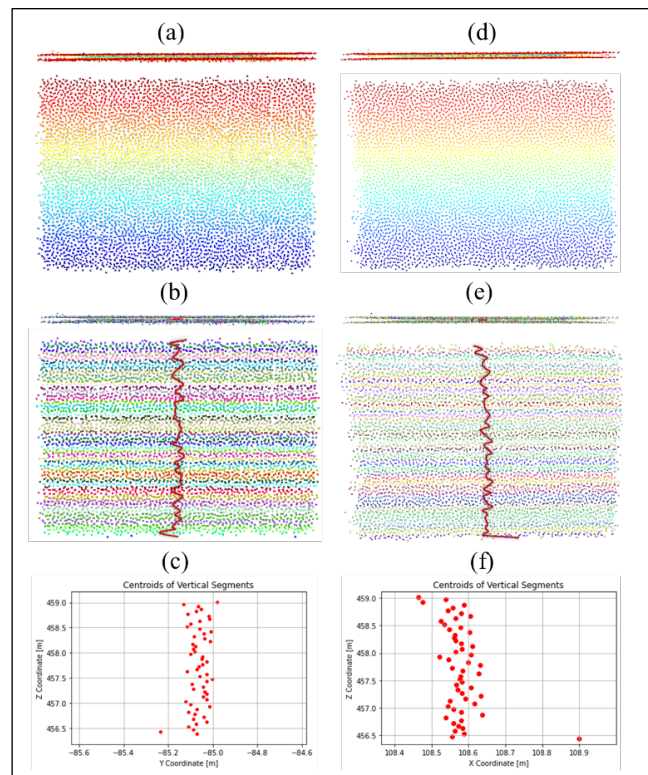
Vertical deviation analysis in walls results. (a) Wall 1 (x -axis orientation), (b) Wall 1 centroids alignment along x - z plane, (c) Wall 1 centroids alignment along y - z plane, (d) Wall 2 (y -axis orientation) (e) Wall 2 centroids alignment along x - z plane, (f) Wall 2 centroids alignment along x - z plane.
